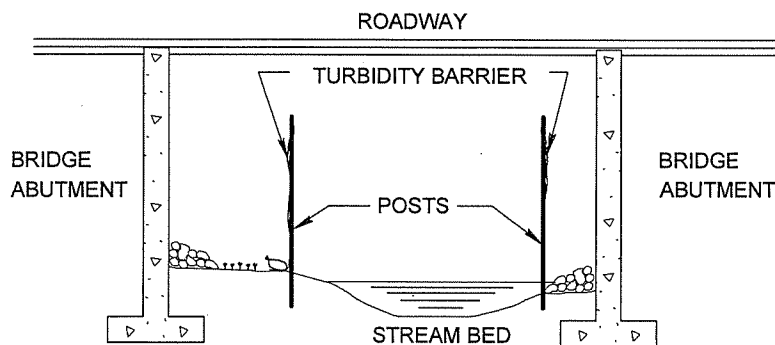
TURBIDITY BARRIER DETAIL SHOWING TYPICAL PLACEMENT AT STRUCTURES
